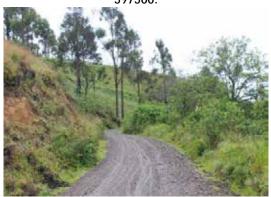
KP8+064. Section of the Ospina Pérez - Iles road. Point of intersection for the Rumichaca - Pasto Divided Highway Project, San Juan - Pedregal segment. Coordinates E 955613 N 597510.
